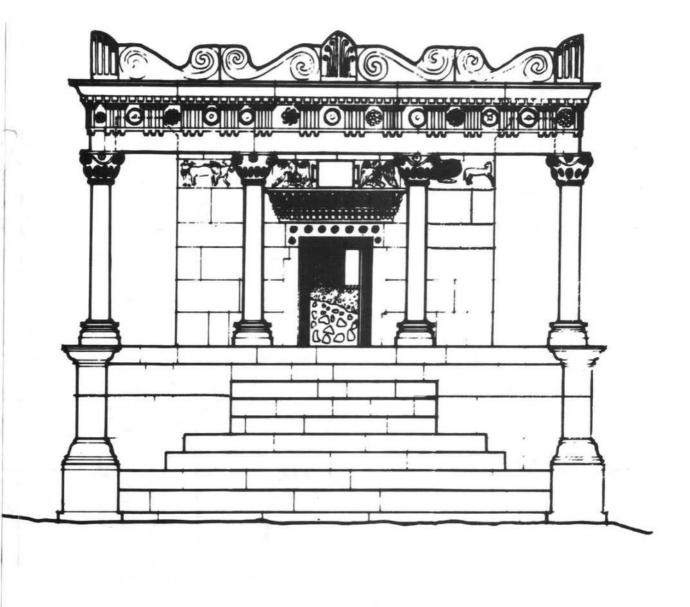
Tomb North A: east and west elevations.Drawn by J. Keelan.
